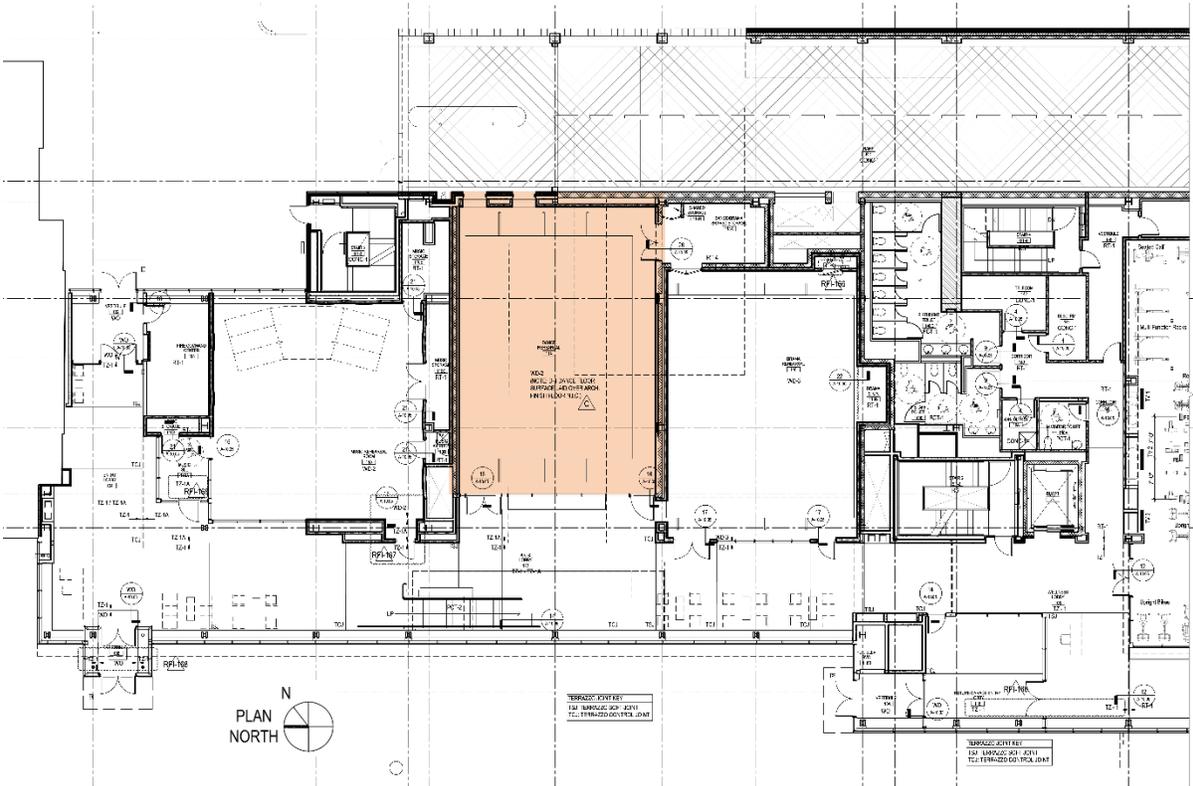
First Floor "North" Plan – Dance Rehearsal Room
